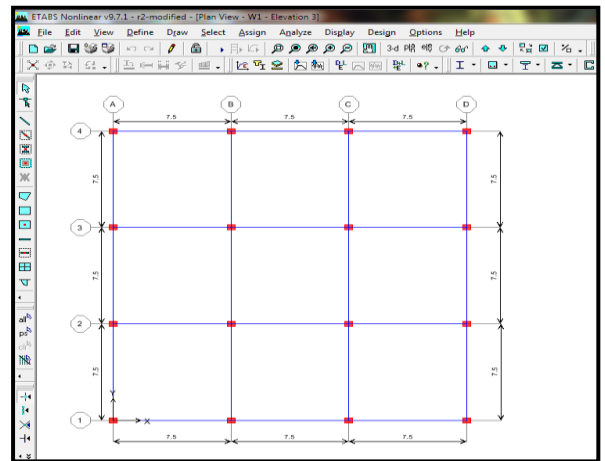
Plan of the structure (ETABS model) (Ref.6)
